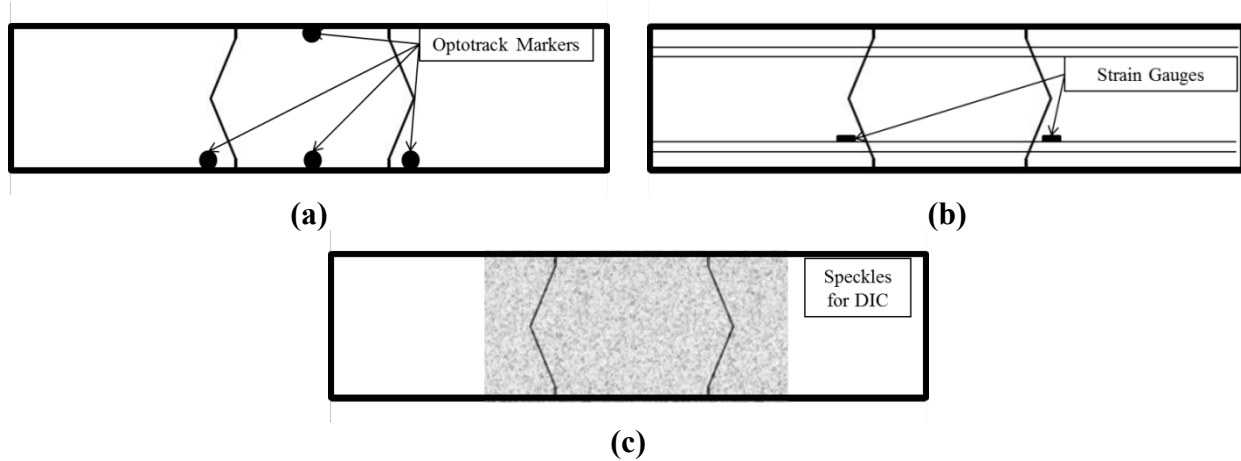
Instrumentation of the Precast Bridge Deck Beams
